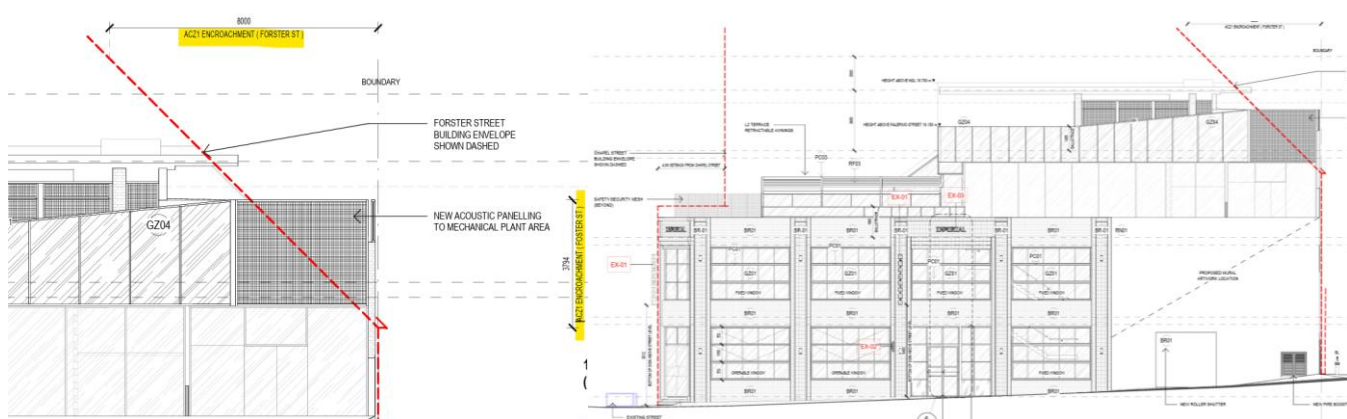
Proposed south elevation showing indicative ACZ1 encroachment (left)
